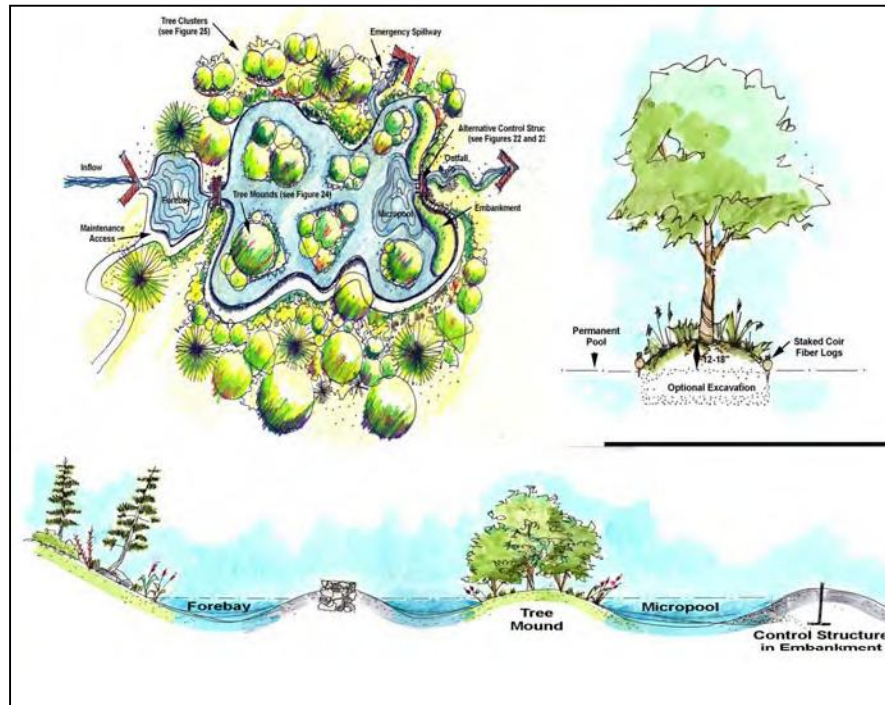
Wooded wetlands are a preferred stormwater treatment option for crossing retrofits.
